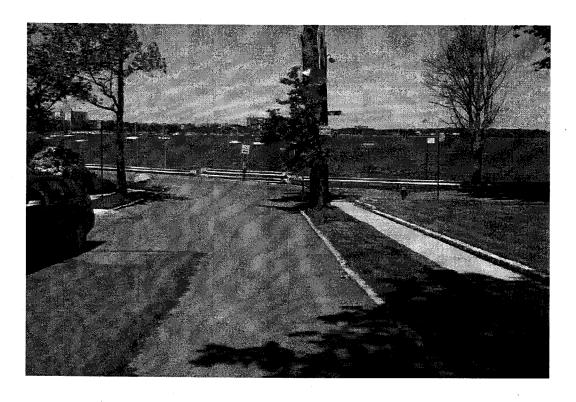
View south from west of Shore Road of the Outfall No. 3 location at the foot of Knollwood Avenue.
